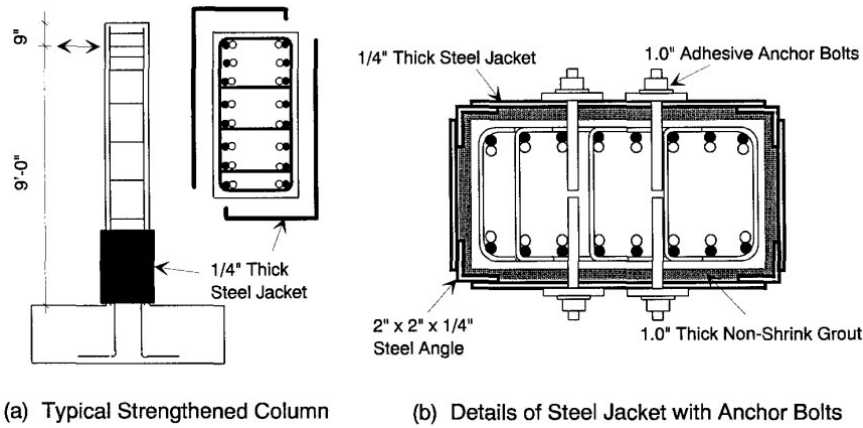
Steel jacket repair measure for lap splices (Aboutaha et al., 1996)
